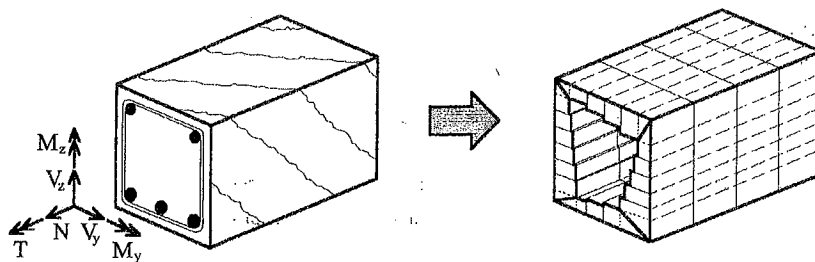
Multiaxially loaded reinforced concrete bar and its discretization
